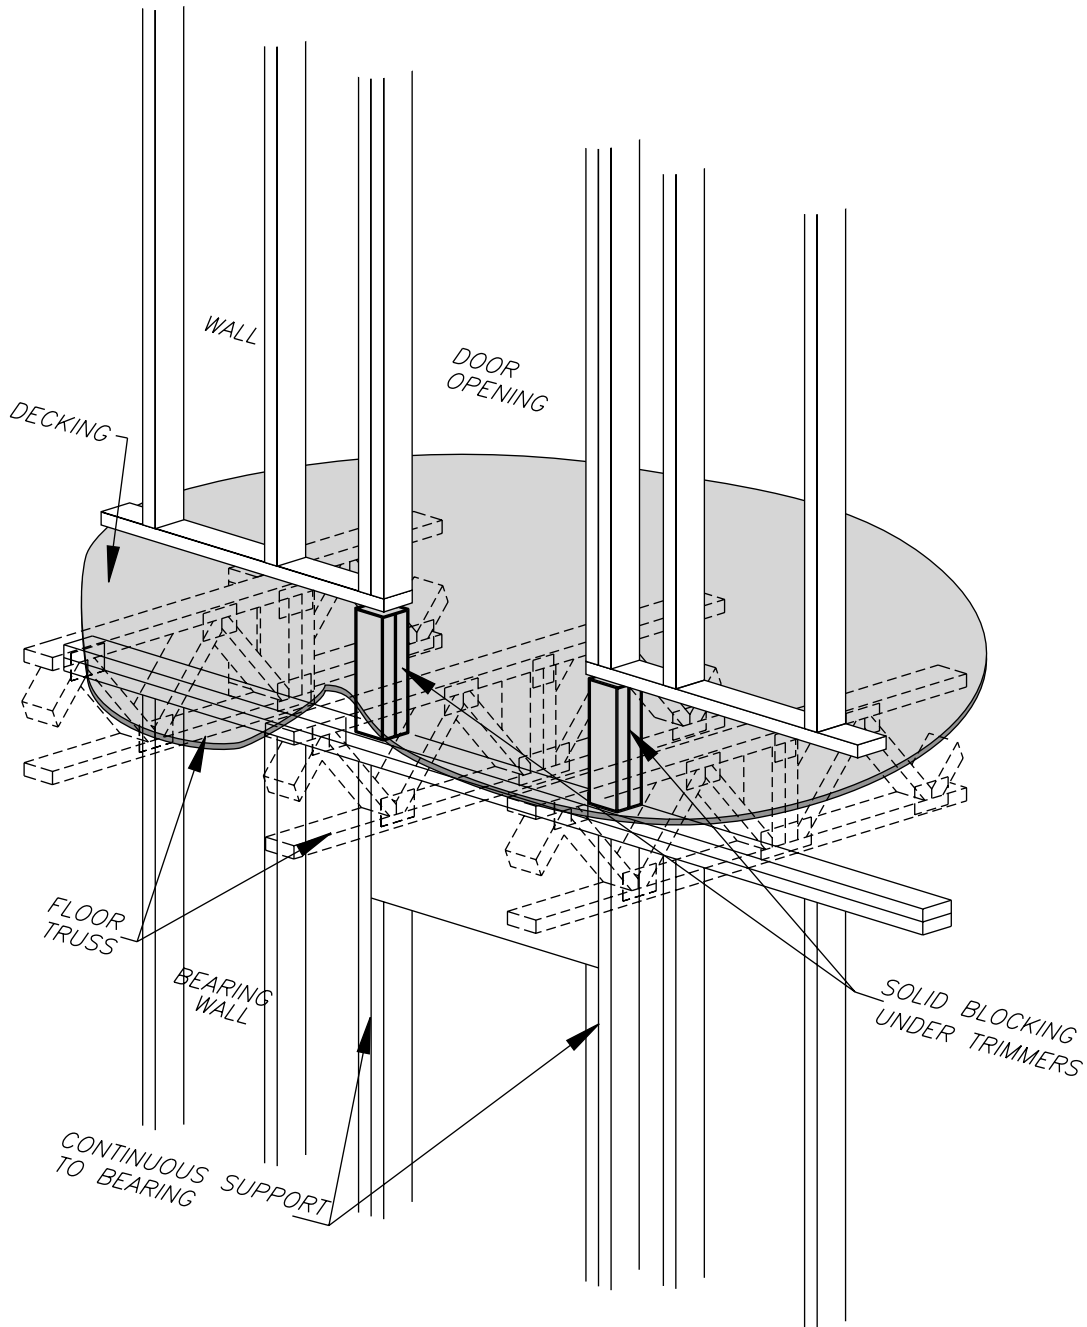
WTCA standard industry detail: Blocking at Wall Type "B". Available for free download at www.woodtruss.com.
